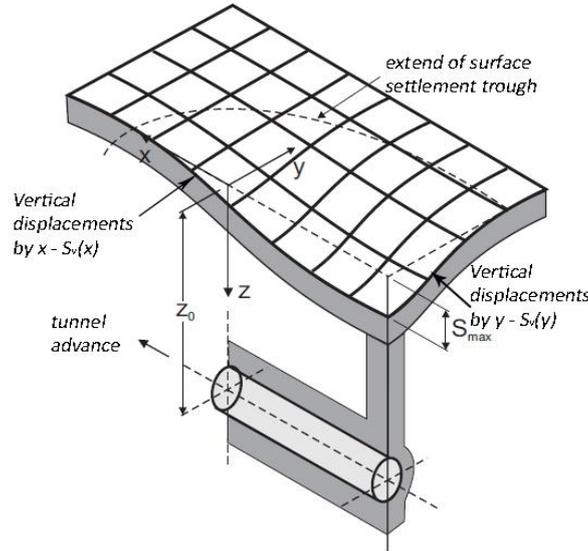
Character of the ground surface settlements under tunnel construction: y – the transverse direction; x – the longitudinal direction (along the tunnel centerline)
